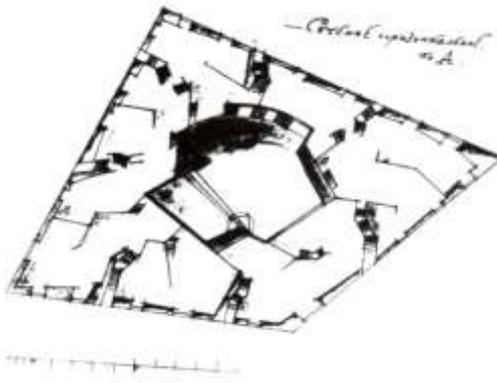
Nikolai Ladovsky. (1920). Communal House. Ground floor plan. Ink and pencil on paper.
